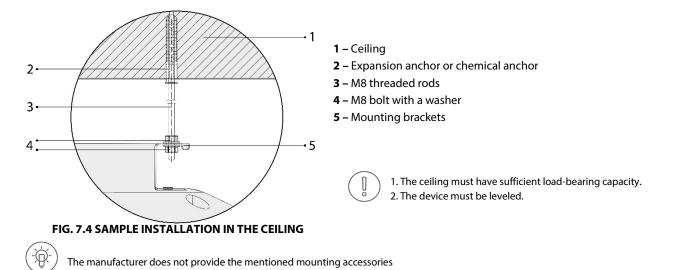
INSTALLATION IN A SUSPENDED CEILING
